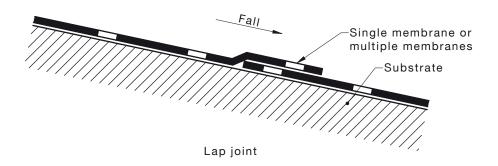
LAP JOINT FOR SHEET MEMBRANE—DETAILS
